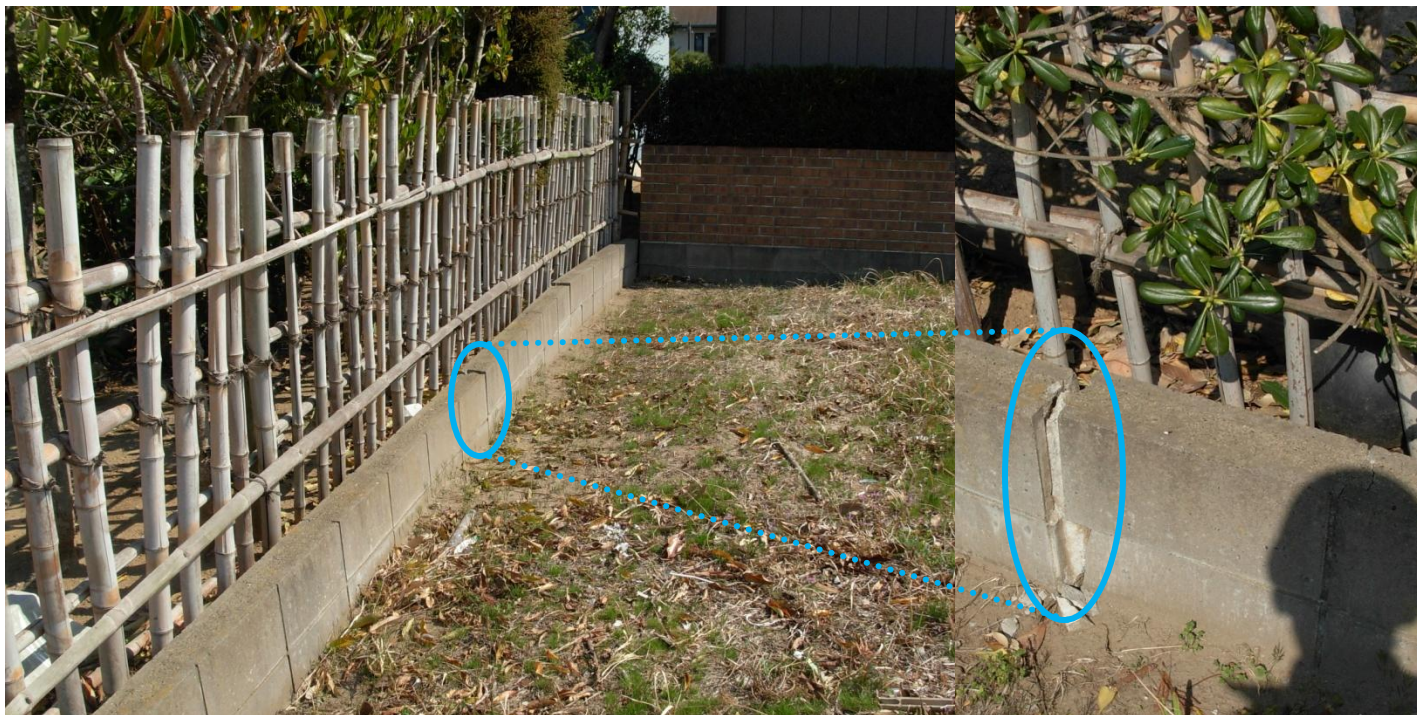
Crack and difference level at the retaining wall. In this case was difficult see, if this wall has steel reinforce, because the crack is not perpendicular to the longitudinal section. On the top of the wall the wide of the crack is around 1.5 cm.
